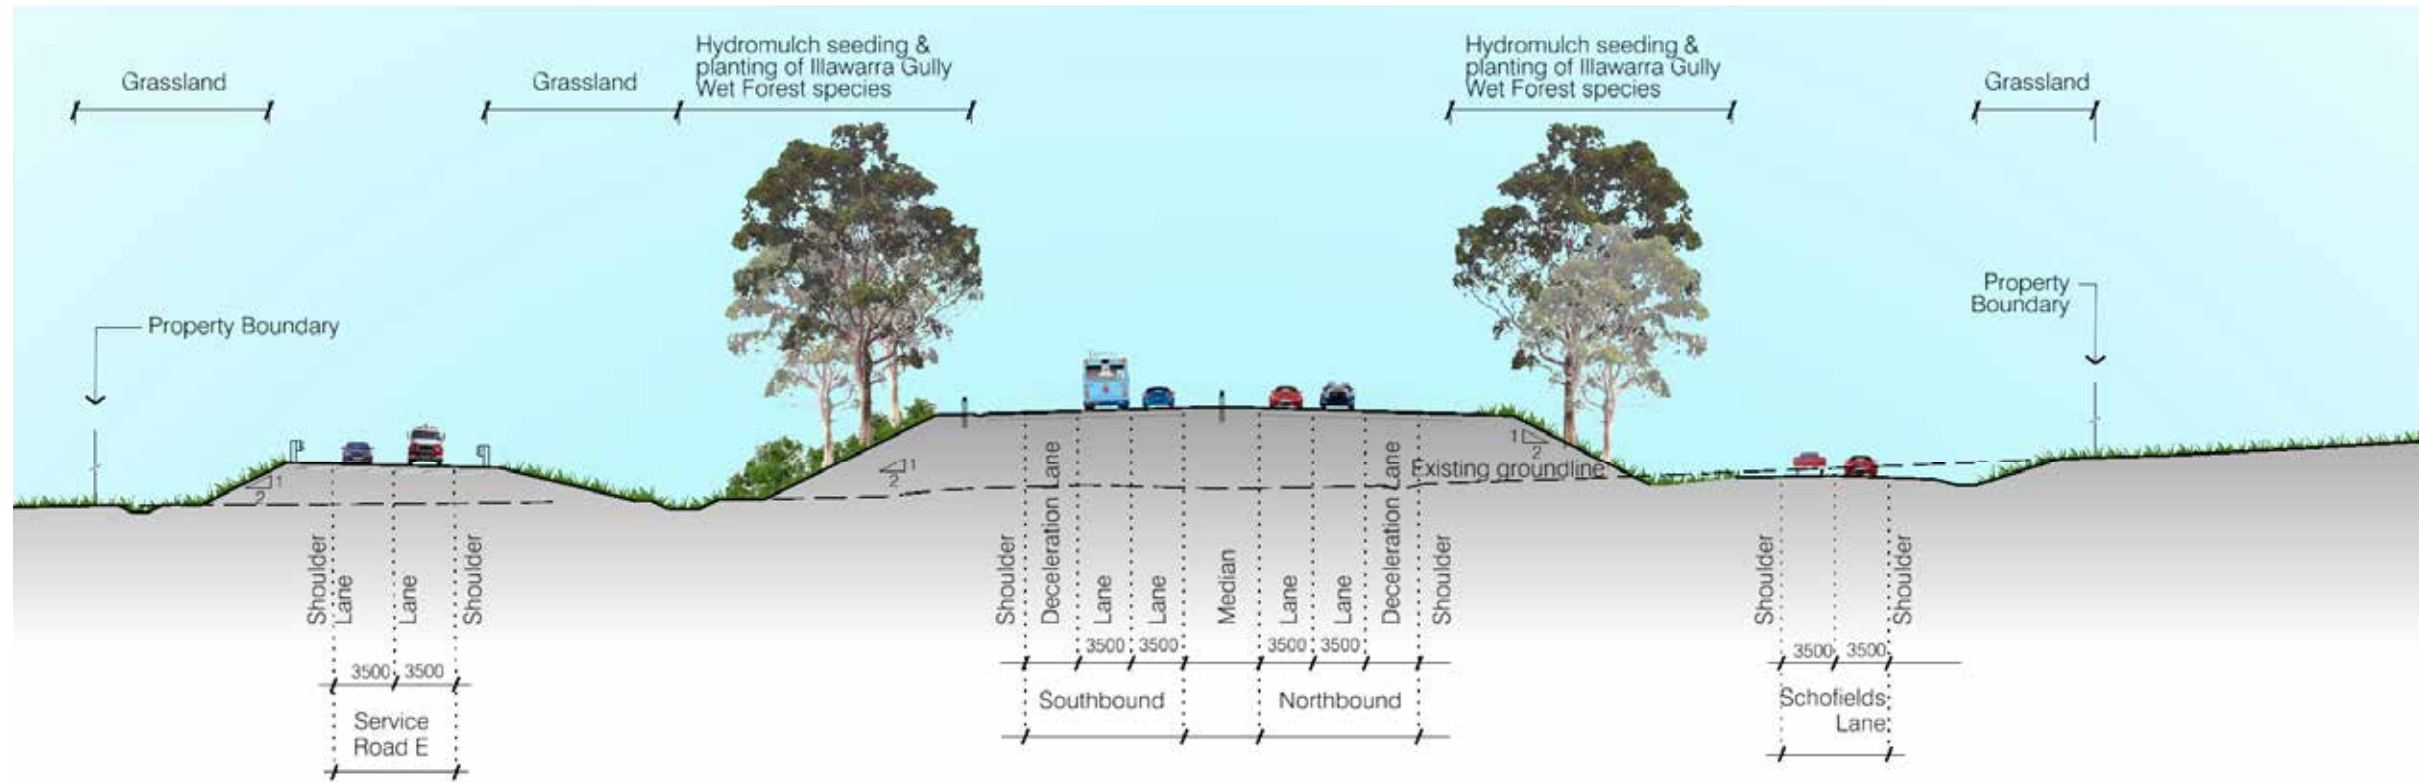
Road cross section at Ch. 18700 (Scale 1:500 @ A3)
